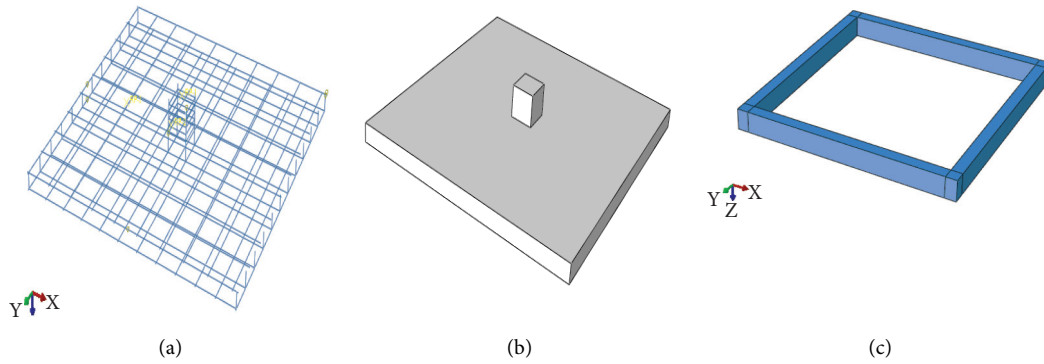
Different components of slab. (a) Longitudinal and transverse reinforcement. (b) Concrete slab and column. (c) Slab support.
